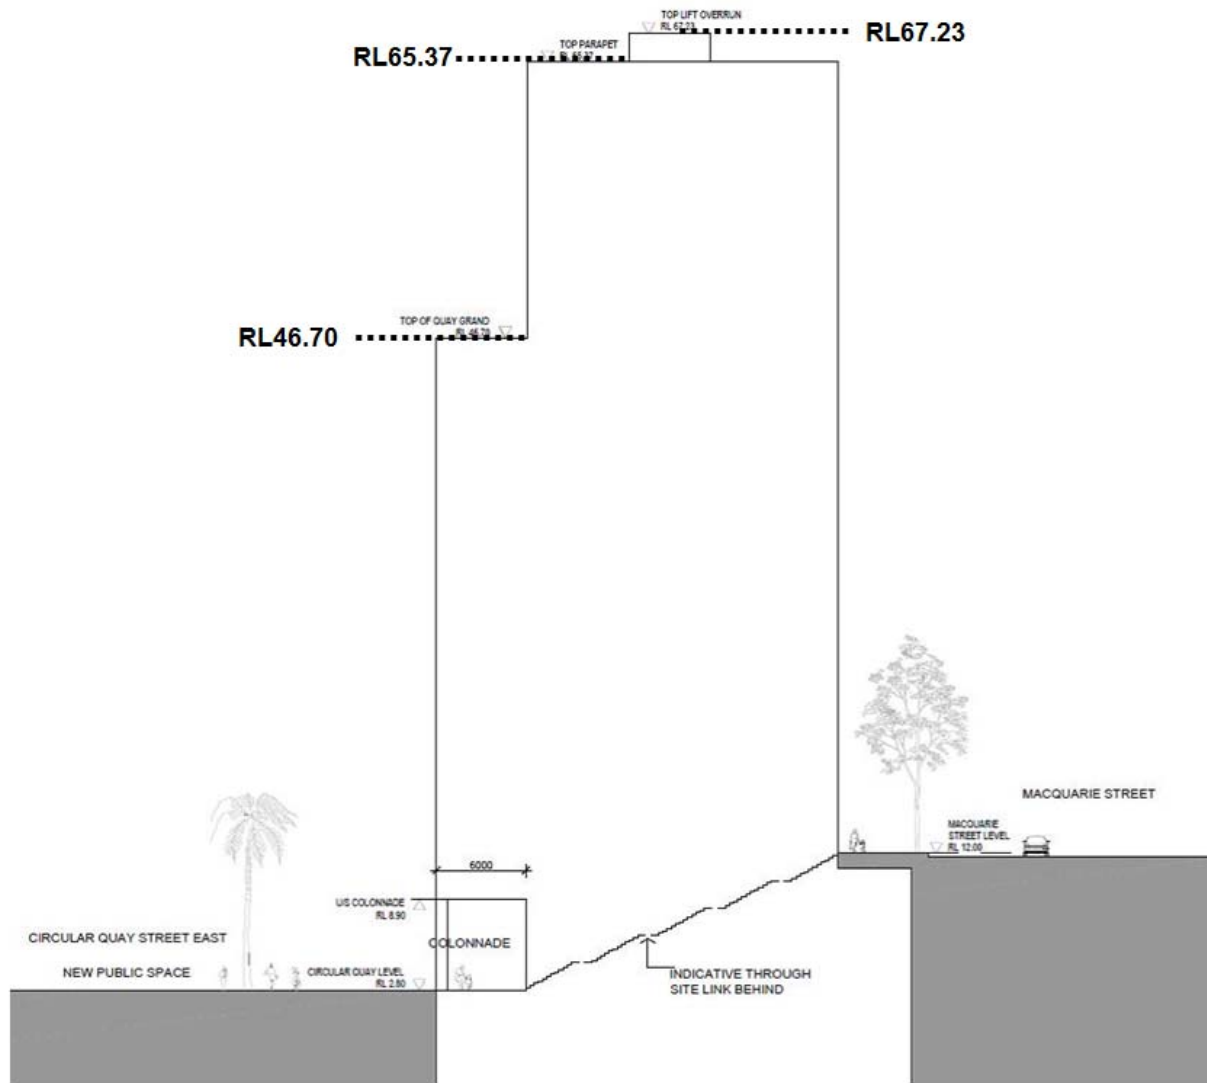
Diagram of the approved section at the through site link and relevant height information.
